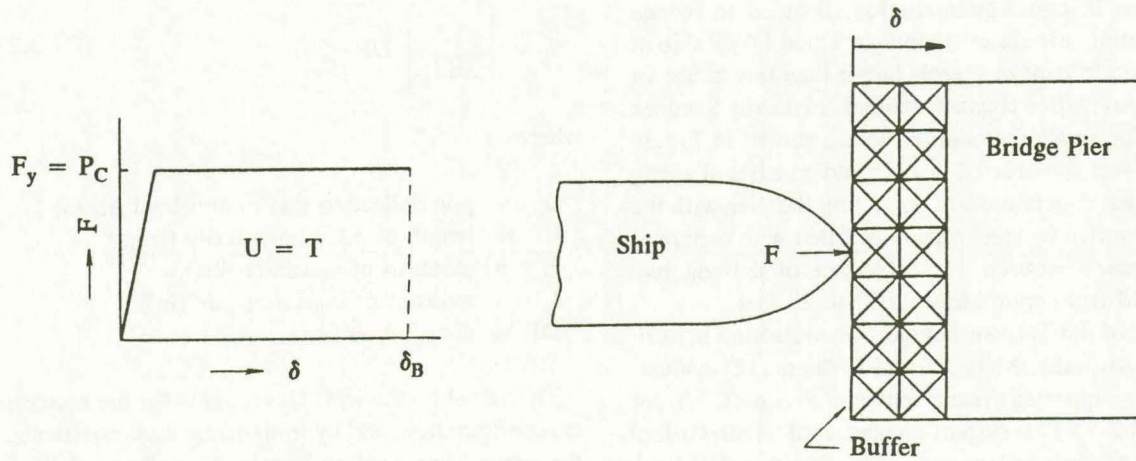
Load-Deformation Relationship of Framed Steel Fender Wall [10].
